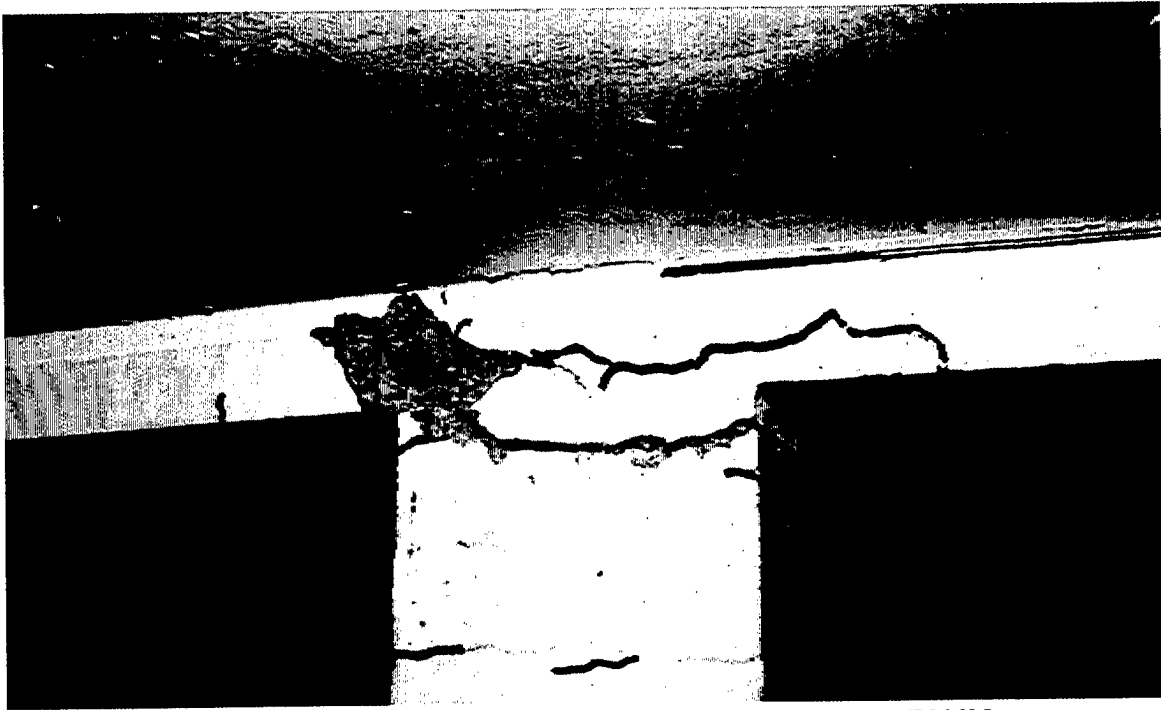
Bottom of Third Floor Slab at SW Column, Post-E200N
